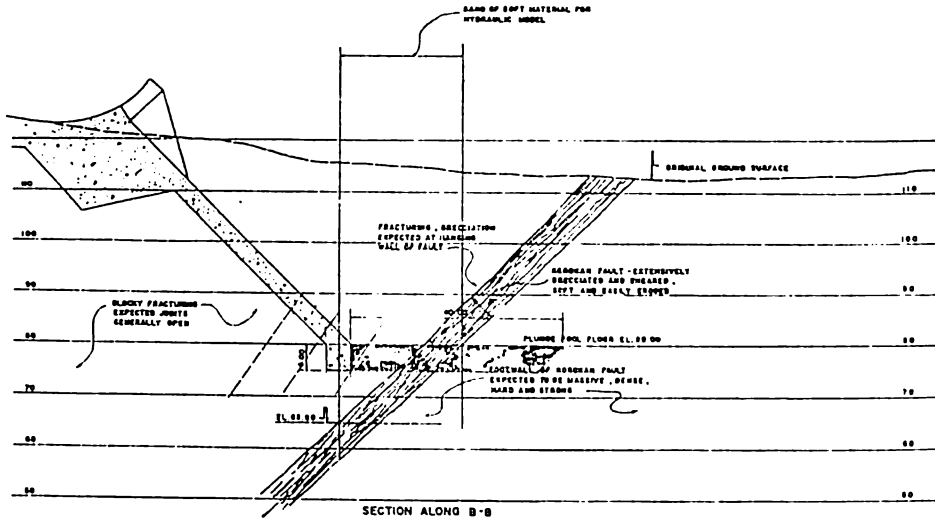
Longitudinal section through flip bucket and plunge pool : section B-B
